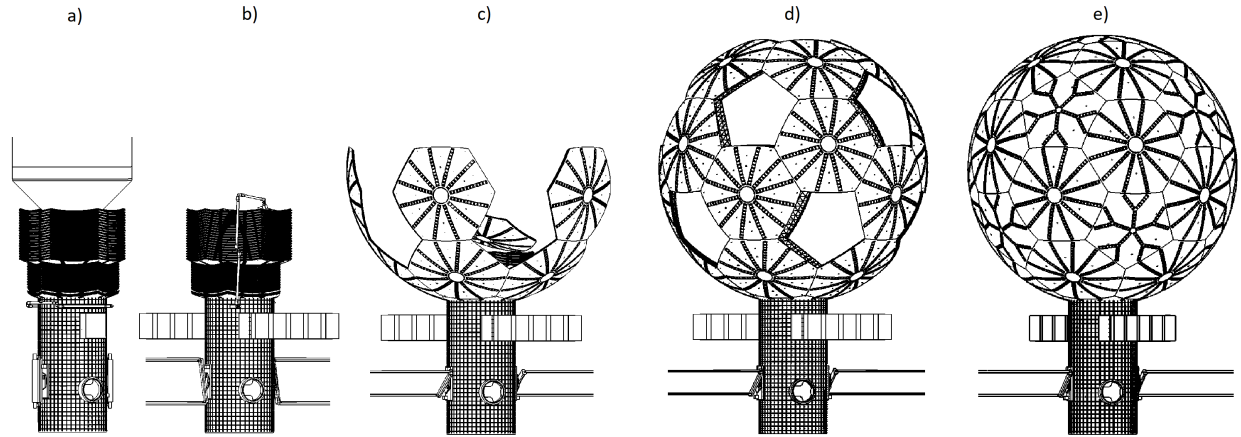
The assembly sequence. Note that all the assembly and segment placement is done from the inside.
